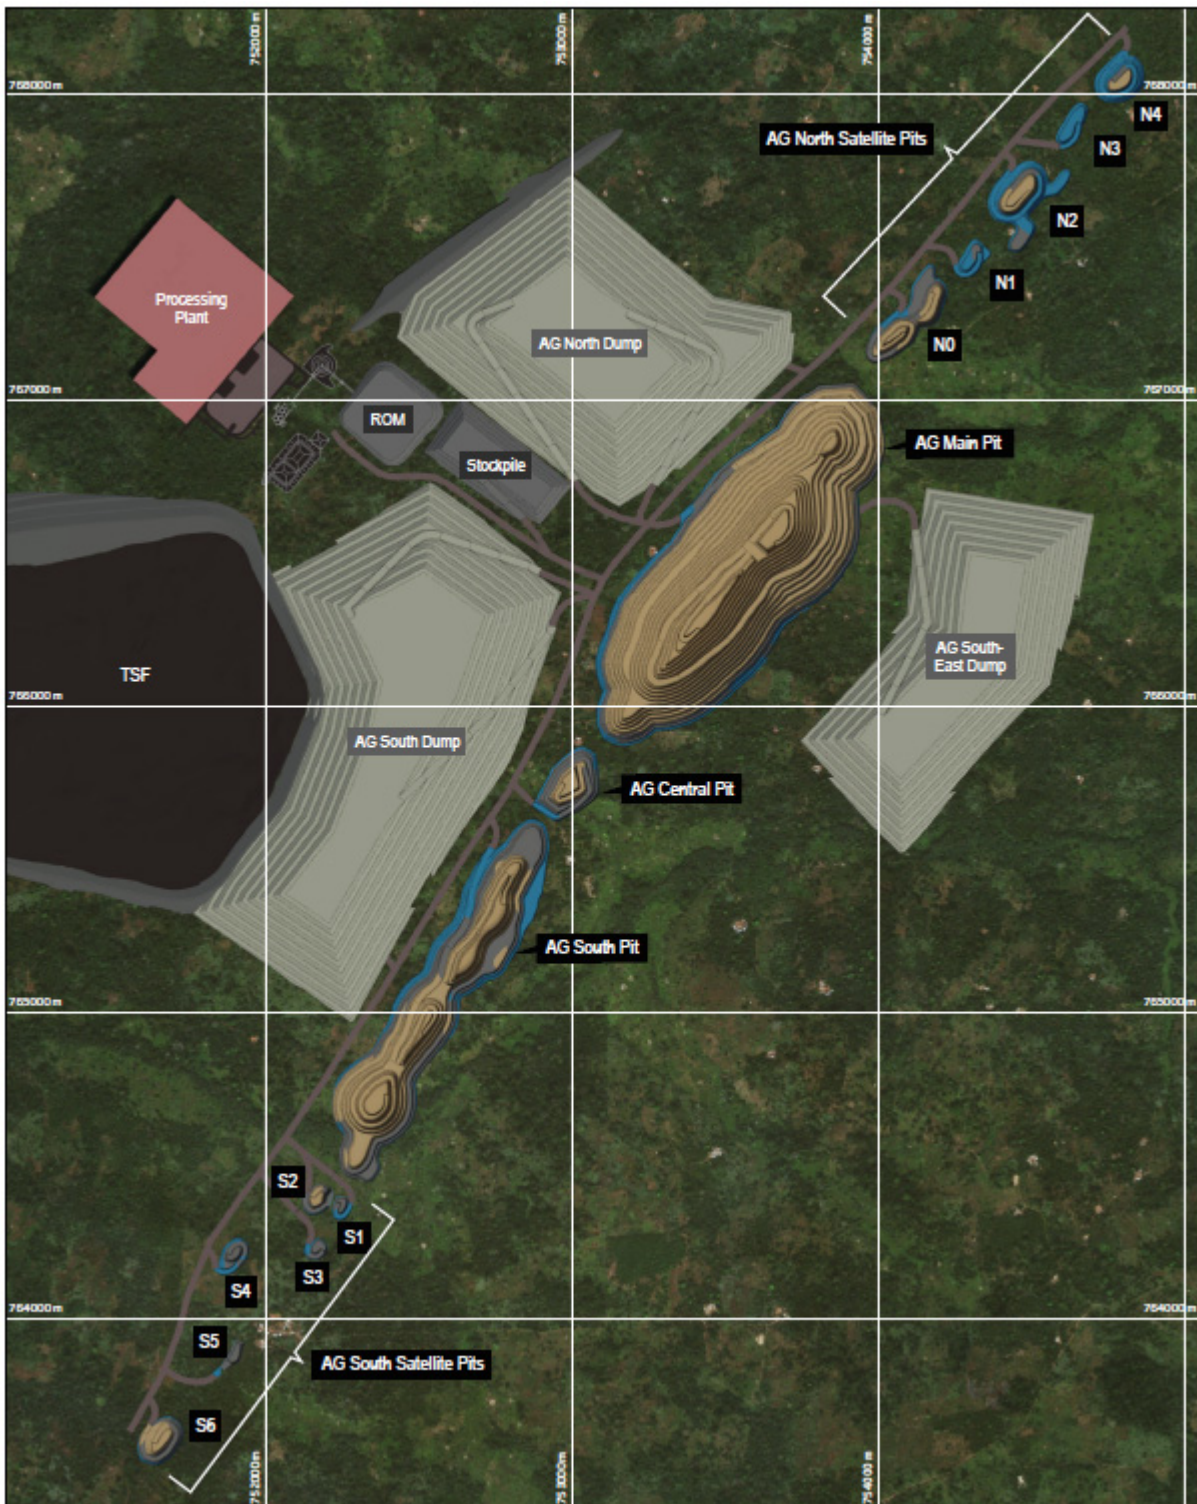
Proposed layout Abujar Gold Project – AG Open Pit
